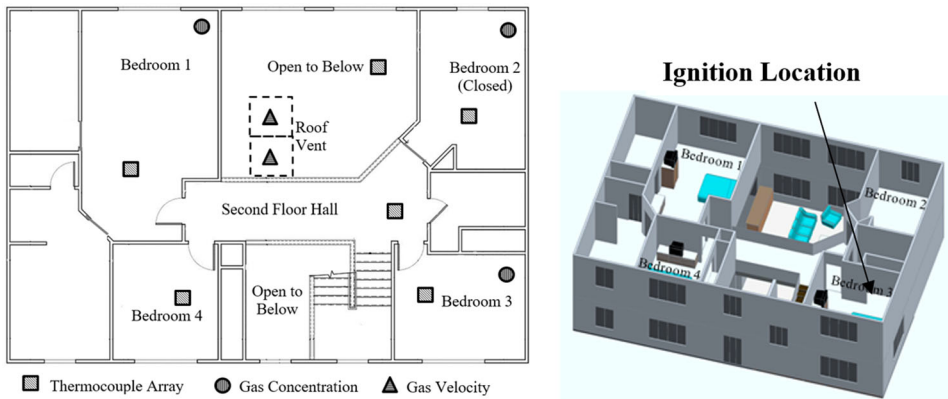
Two-story house second floor plan and 3D rendering showing furniture and ignition location.
